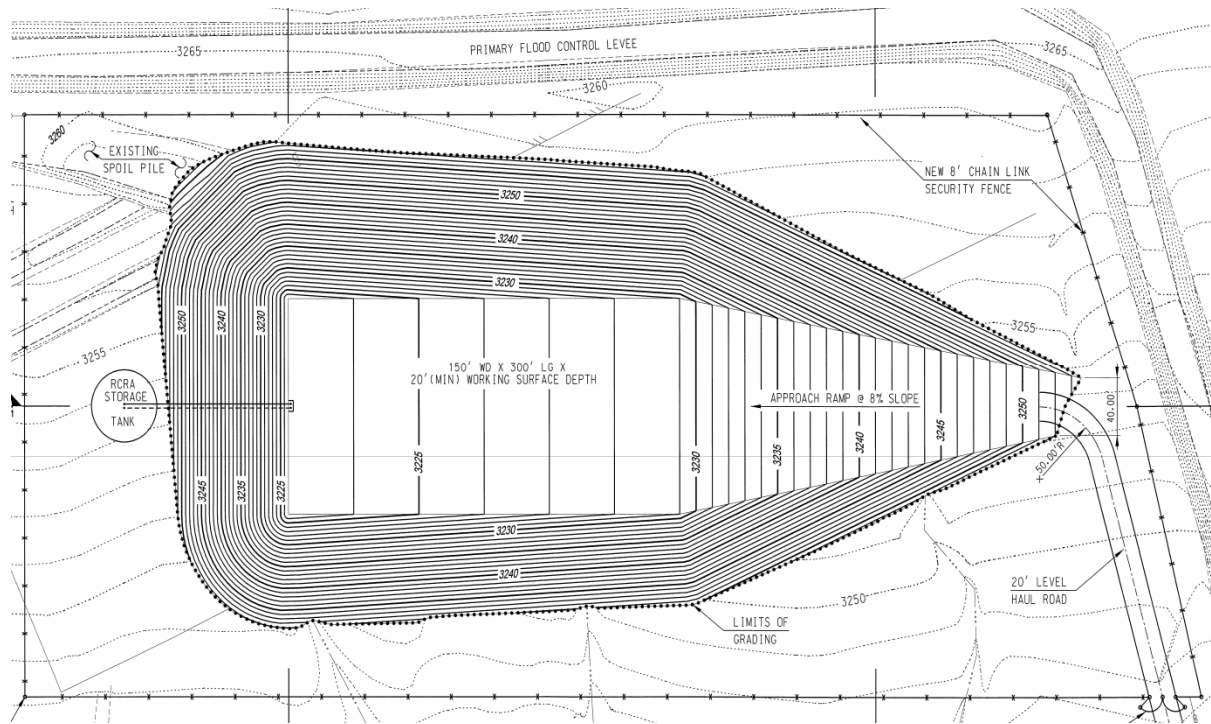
Conceptual mixed waste disposal unit site plan included in permit application.
